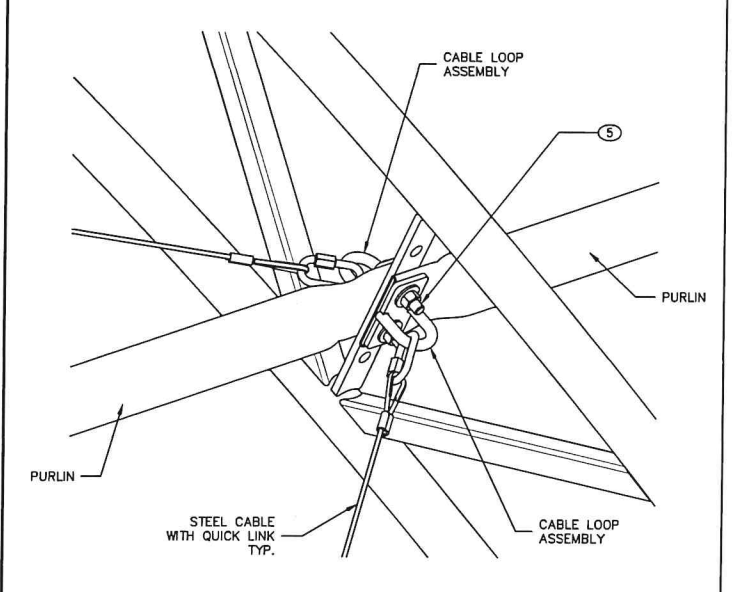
RIDGE PURLIN AT BOLT IN WEB
